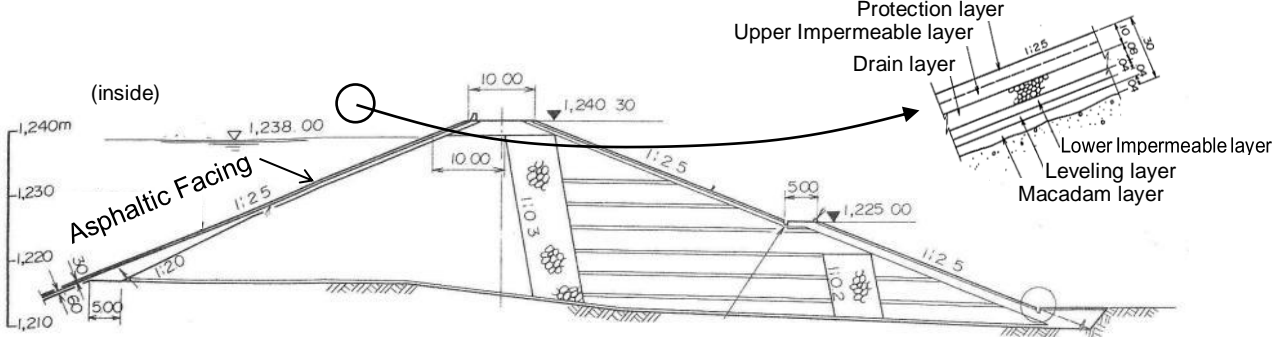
Cross Section (Asphaltic Facing Rockfill Dam)
